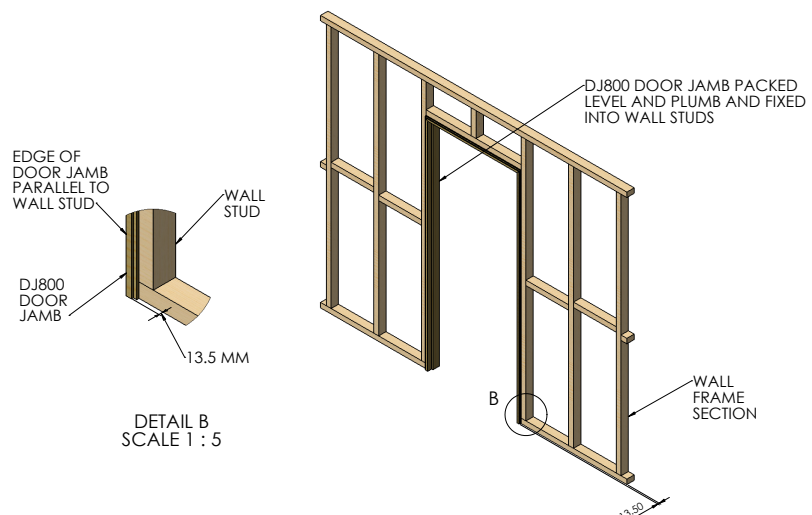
DOOR JAMB INSTALLATION DETAILS
